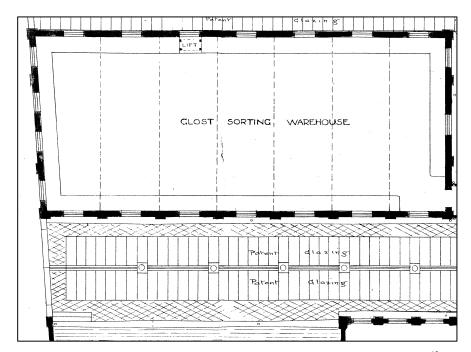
Plan of Building S with part of the 1928 dipping house below 18
